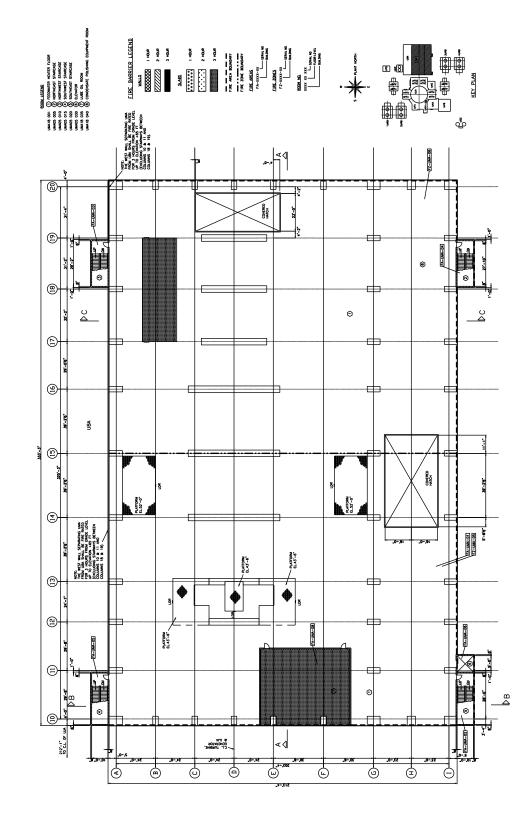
B-2 {Fire Barrier Location, Turbine Building Plan at Elevation 0 ft}
